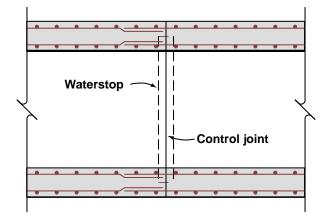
Typical control joint used in reinforced cast-in-place concrete conduit construction. Longitudinal reinforcement is continuous through the joint.
